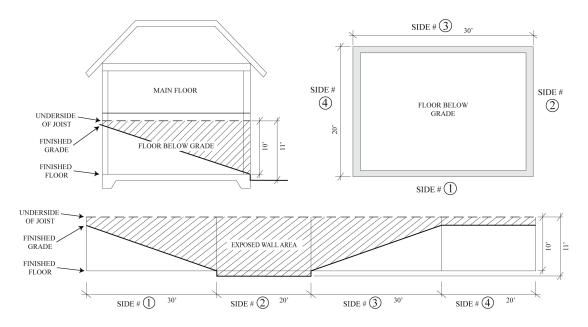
Illustrative example for calculating the floor below grade adjustment
